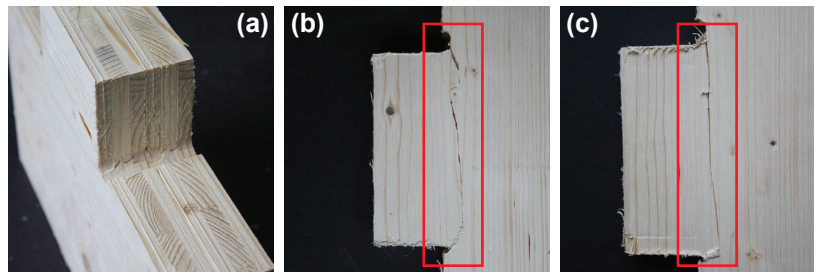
Failure pictures of T5 specimens: (a) Axonometry / (b) Side view 1 / (c) Side view 2.
